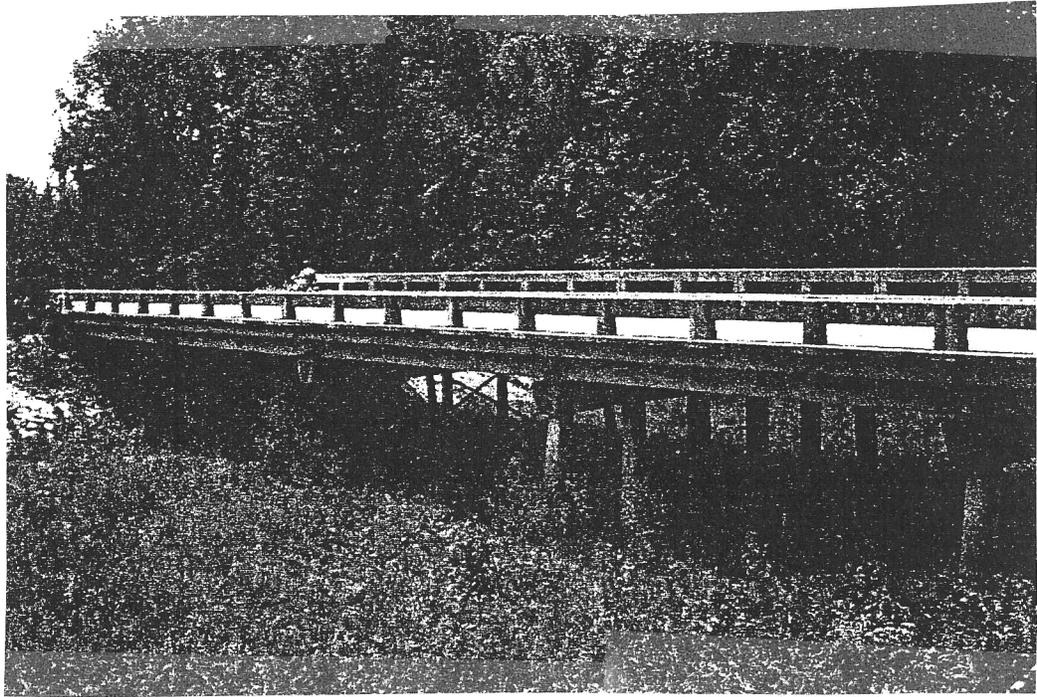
One-Story Bridge with Steel H-Pile Encased and Sway-Bracing Omitted
